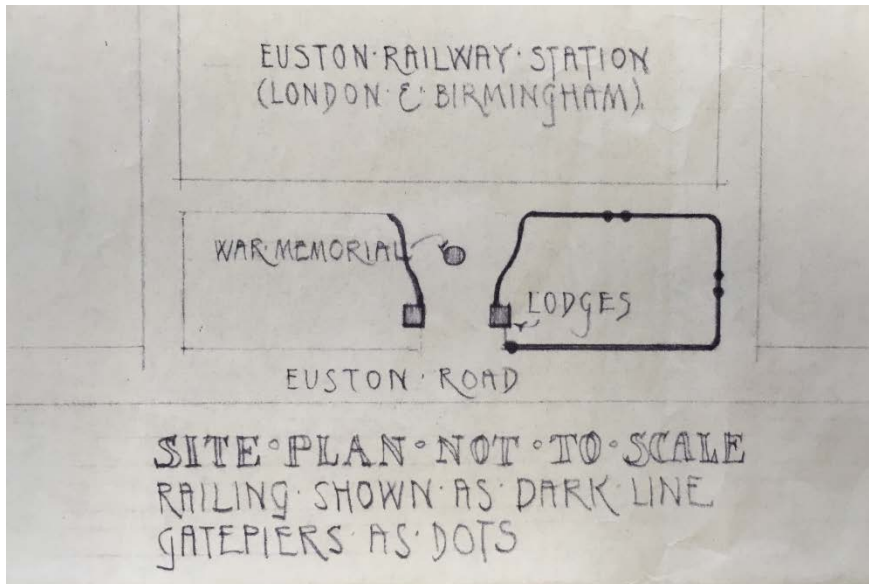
Detail from GLC 1975 drawing of gate pier and railings arrangement (Copyright: City of London Corporation)
